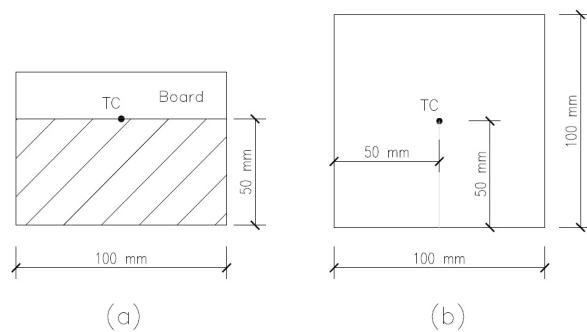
Set – up of test specimen: (a) cross-section; (b) top view of timber surface
